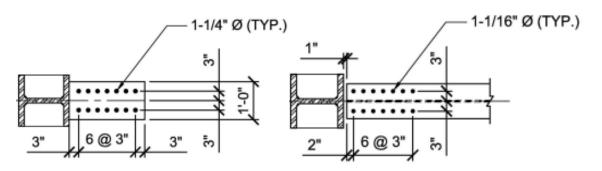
Bolt schedule details for the specimen No. BFP: (a) flange plate; and (b) beam flange (Sato et al., 2007)
